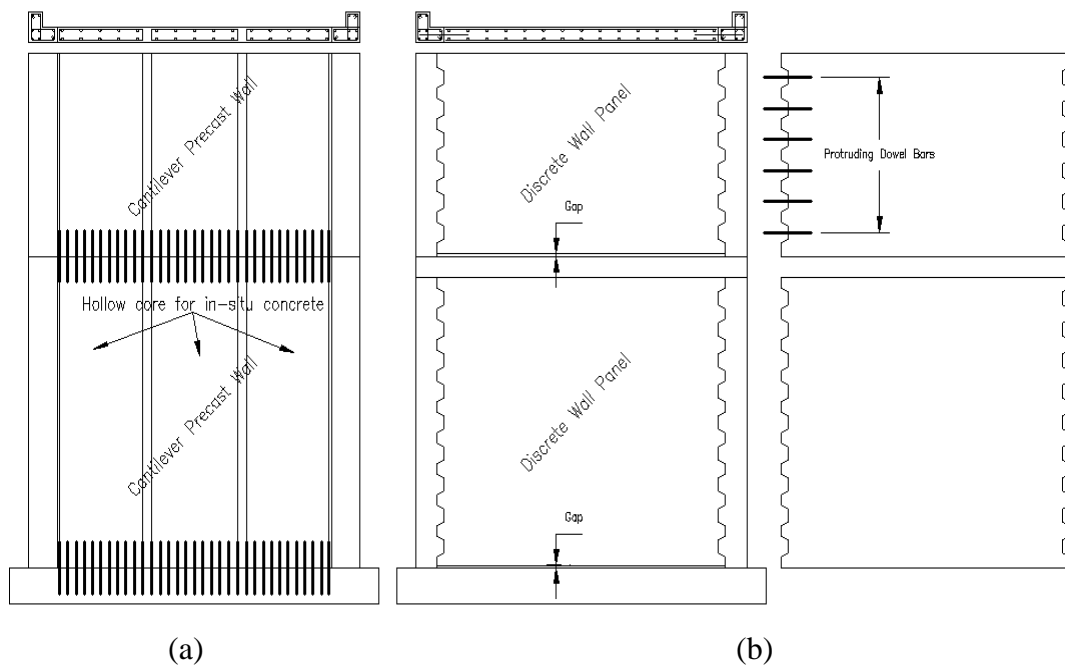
(a) Cantilever wall system and (b) HC precast wall system (HCPS)
